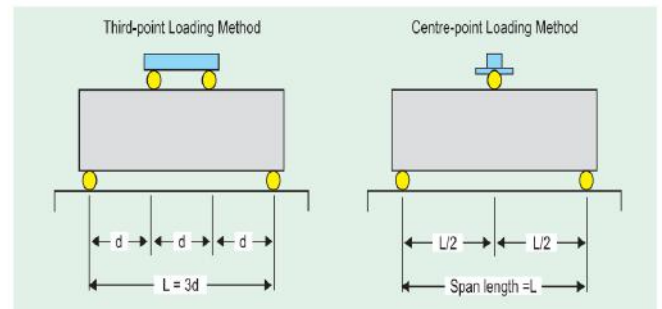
Flexural Test for Beams- Third Point Loading and Centre Point Loading
